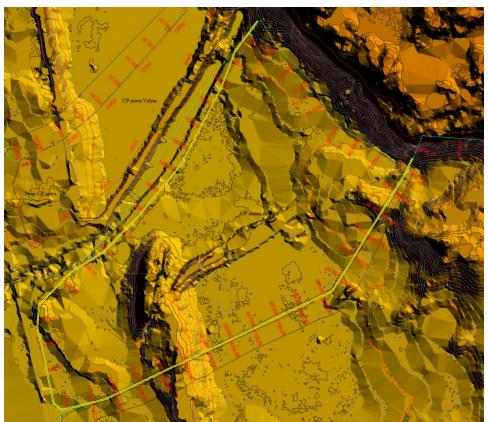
Plan view of southern clarification pond embankment (yellow) with previous location on the western section indicated with green line.
